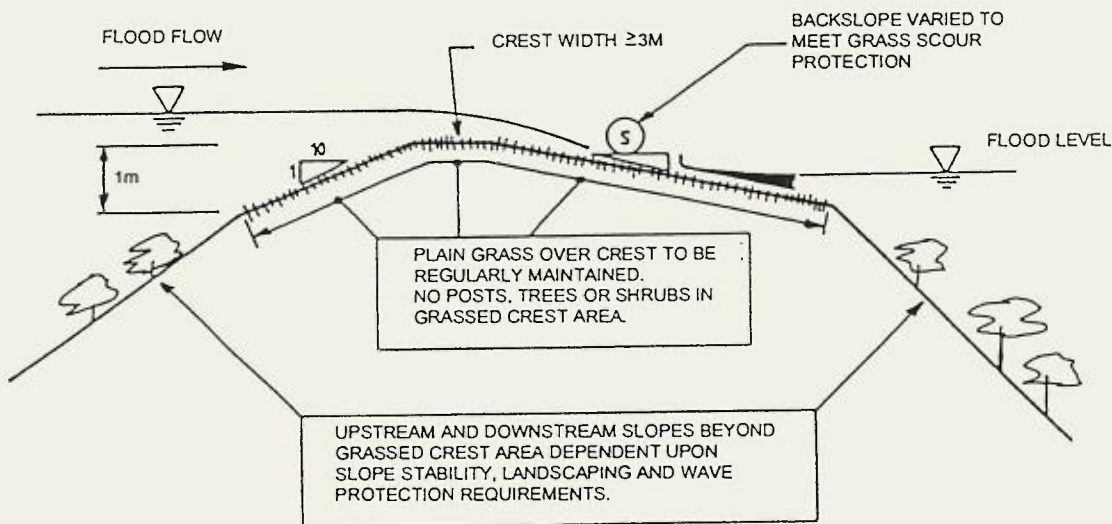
Lake-to-Lake Weir - Typical Section (Weirs 1,4,6 and 8)
